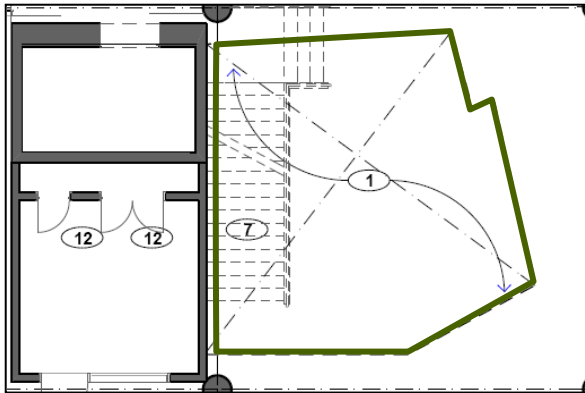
Second Floor Slab Demolition Plan, Courtesy of Core Architects
